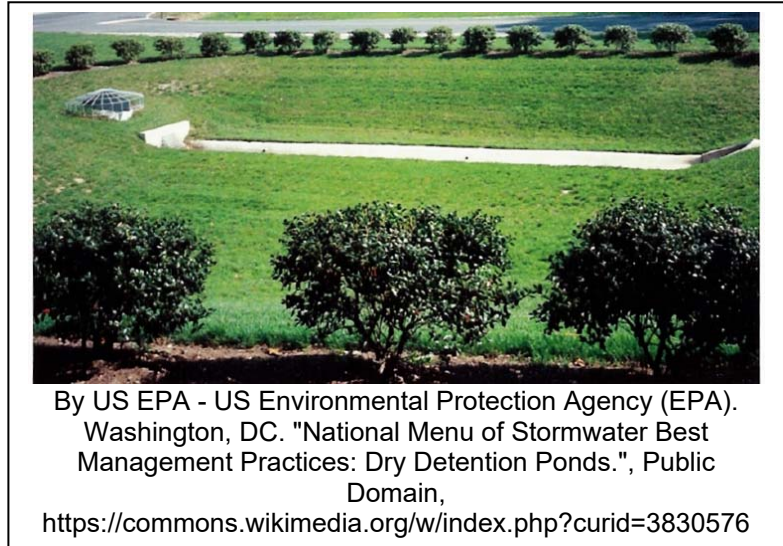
Example of a detention pond used for stormwater management from roadway runoff.
